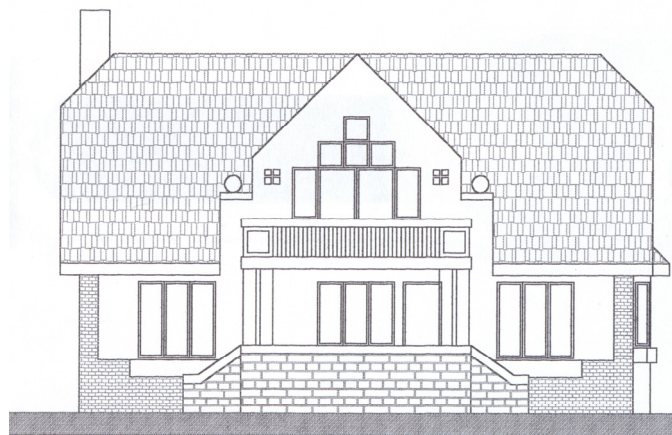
B. Family House, Timisoara, M. Mutiu arch. Garden Elevation
